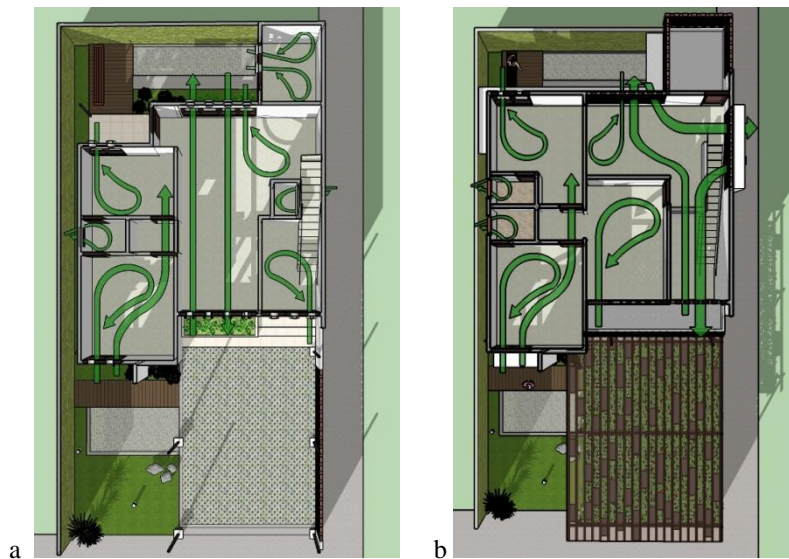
(a) The optimization in layout arrangement and the ventilation setting on 1st floor; (b) 2nd floor
